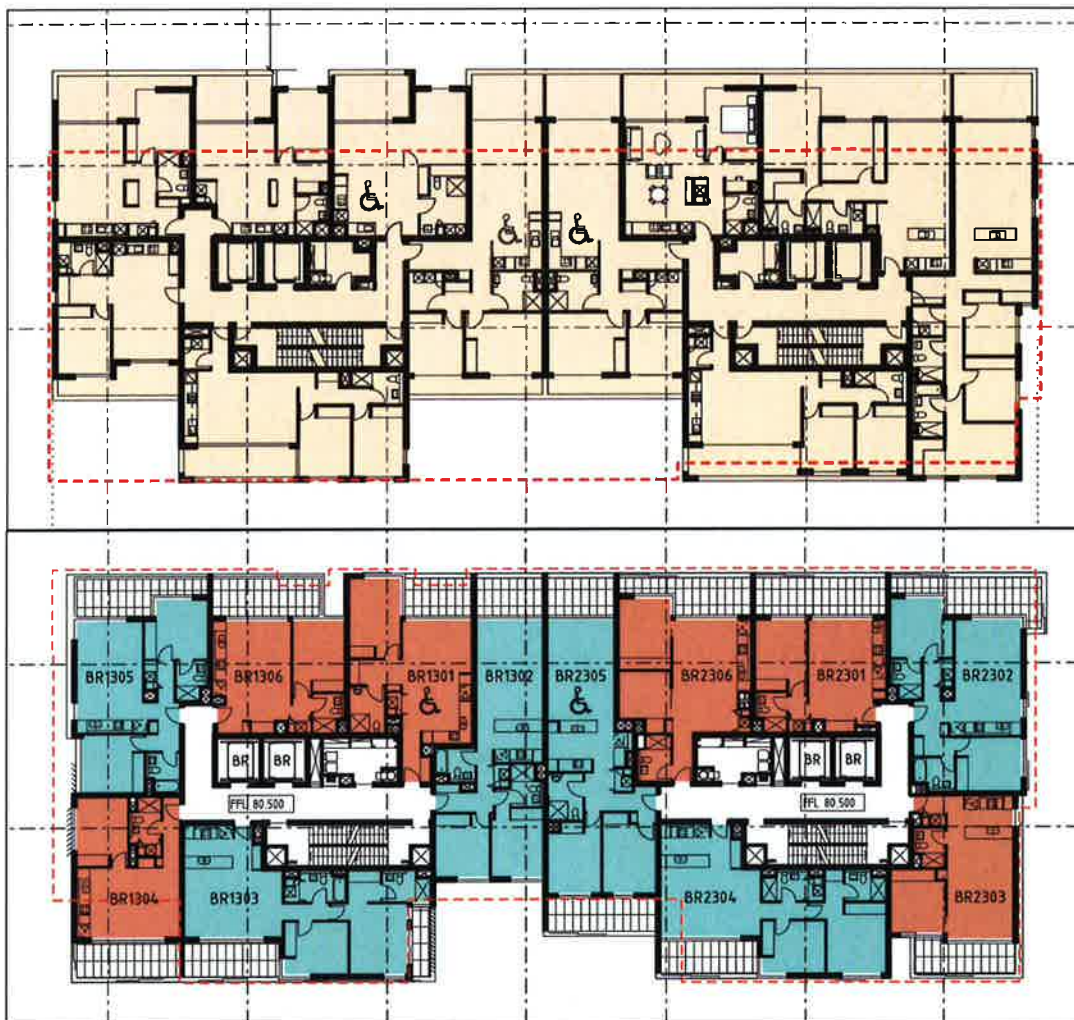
The Level 3 floor plan of Building C / the Brisbane Building as approved in Modification 1 to the Concept Plan (above) and proposed as part of this application (below)
